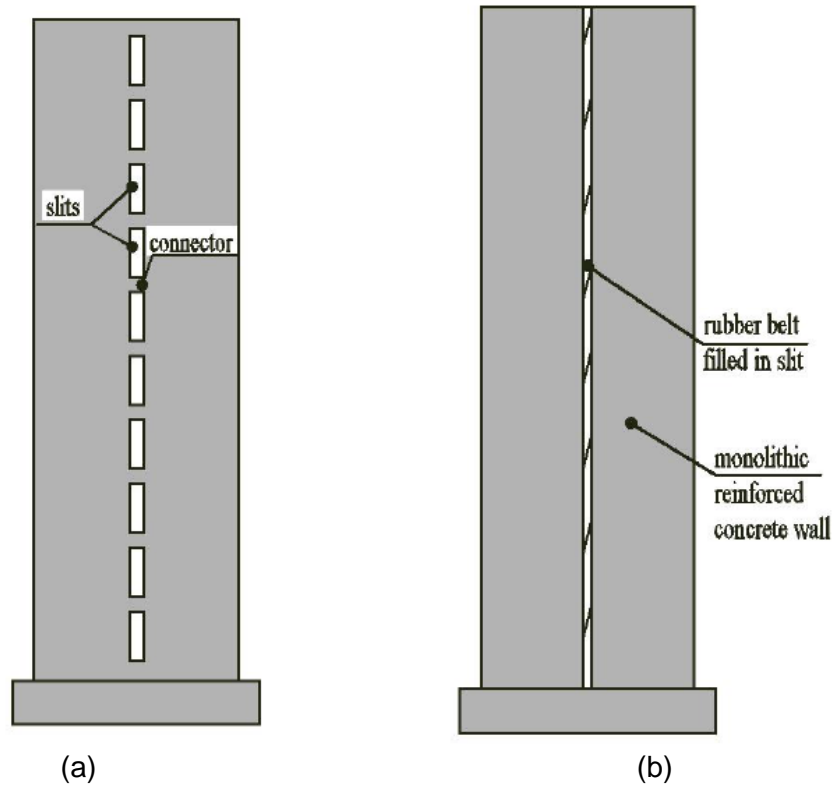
(a) Slit wall with connectors, (b) Slit wall with rubber belt filled in (Baetu, 2011)
